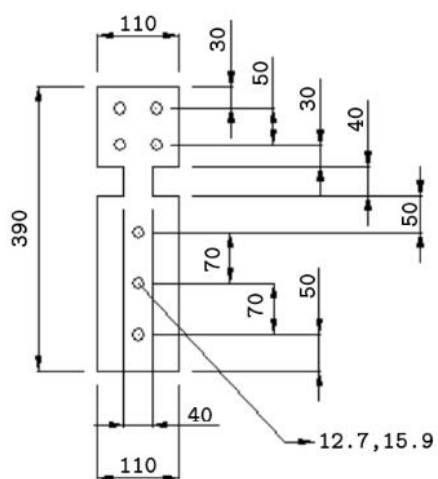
Geometry of the end plates and locations of the strain gauges (dimensions in millimeters) [24]
